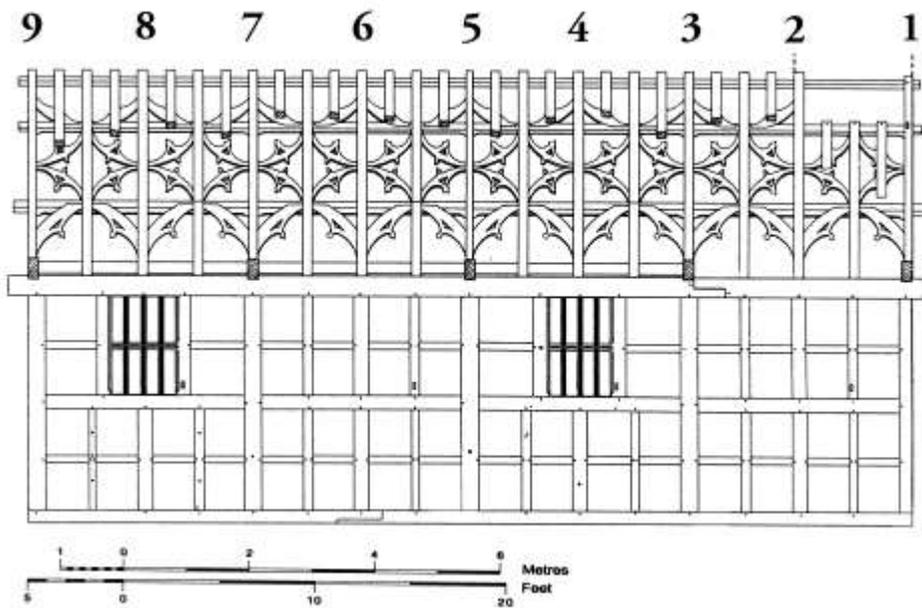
Chapel Farm – north elevation reconstructed (based on RCHME 1992 drawing)
